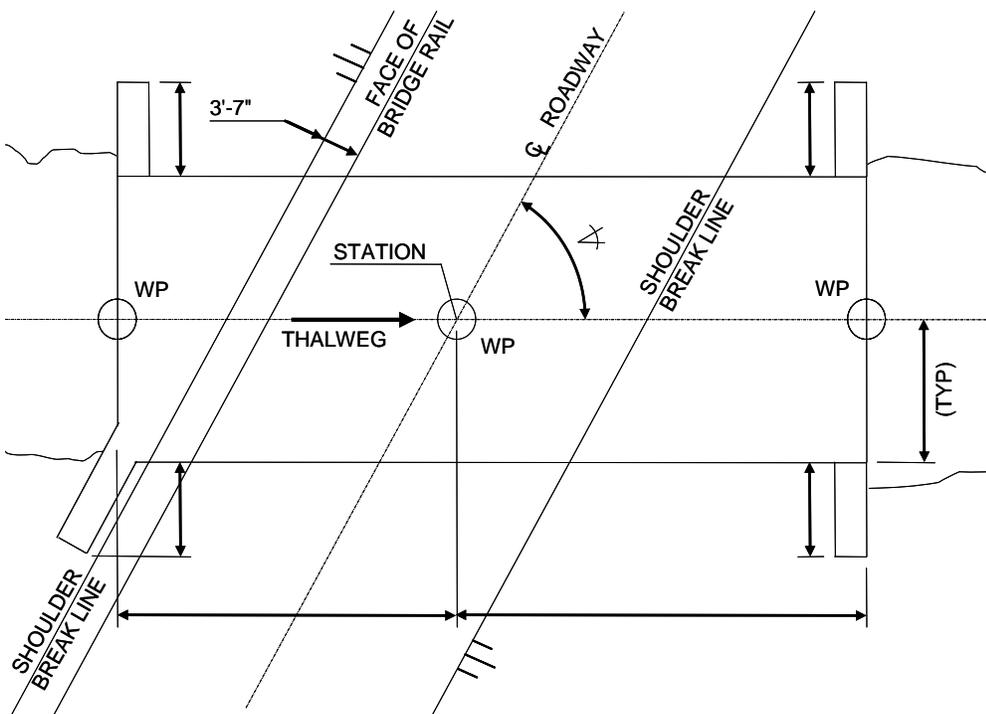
Pipe, Small Box or Small Frame
